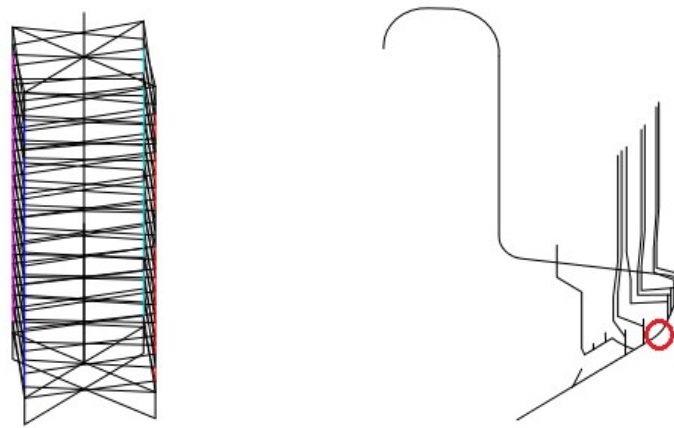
Left: stick model of the containment building (inner wall, outer wall and internal structures); Right: steam line beam model, where the red circle points to the location of the vertical stop.
